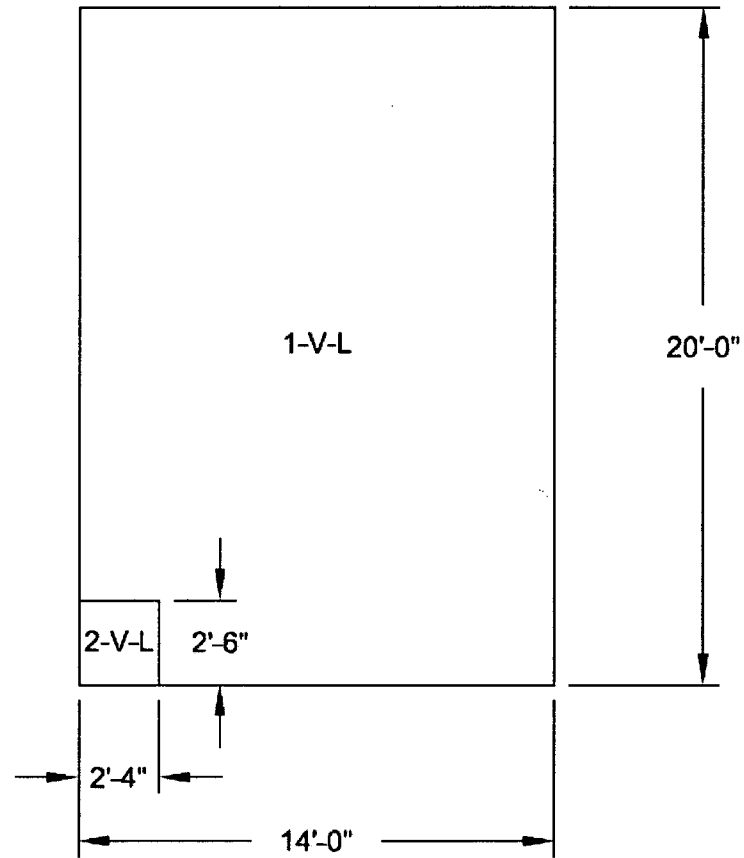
H.6-170 Wall 8 Looking From Outside Horizontal Reinforcement Zones
